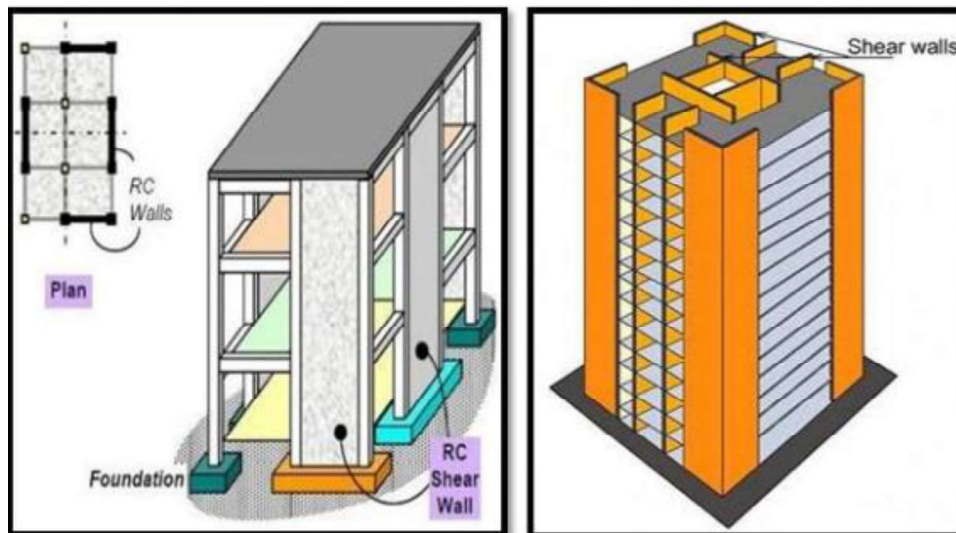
Reinforced concrete shear wall in building Source: Murty C. V. R (2005)
